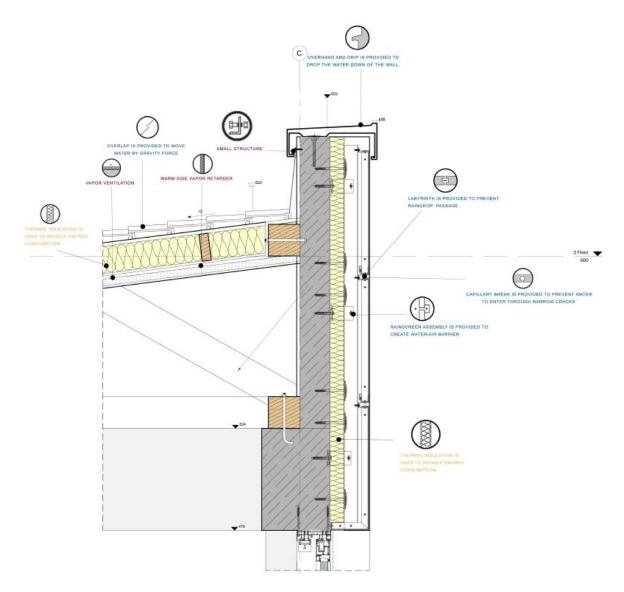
An example for detail design with detail patterns (Detail 3: Exterior wall - roof joint).
